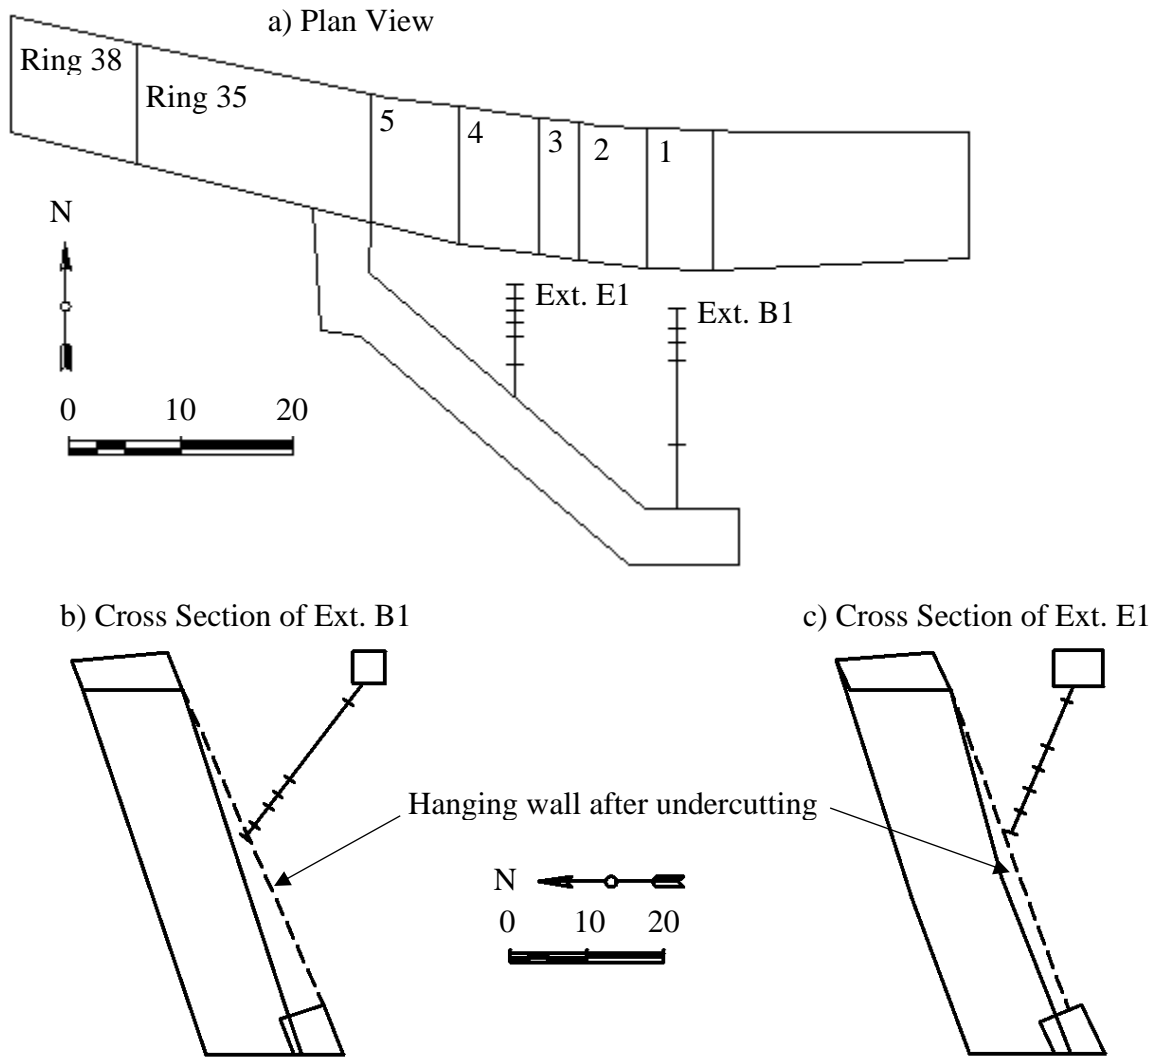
Section views of the Mount Isa 5HP1 stope showing the extensometer location and the stope excavation sequence in (a) plan view, (b) cross section of extensometer B1, and (c) cross section of extensometer E1 (after Milne, 1994).
